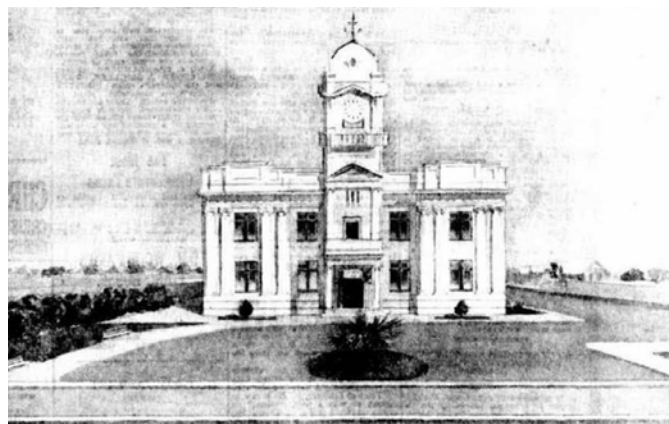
I.G. Anderson, Elevation drawing of proposed Geelong West Town Hall. Source: *Geelong Advertiser*, 19 May 1923, p.13.
